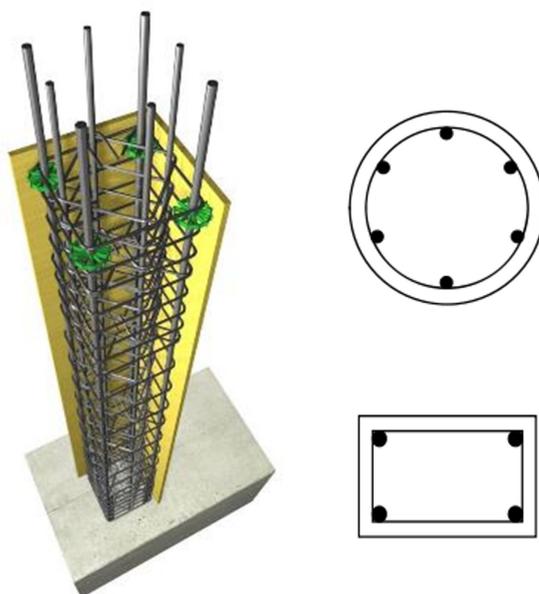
Typical detailing of longitudinal reinforcement in columns.
